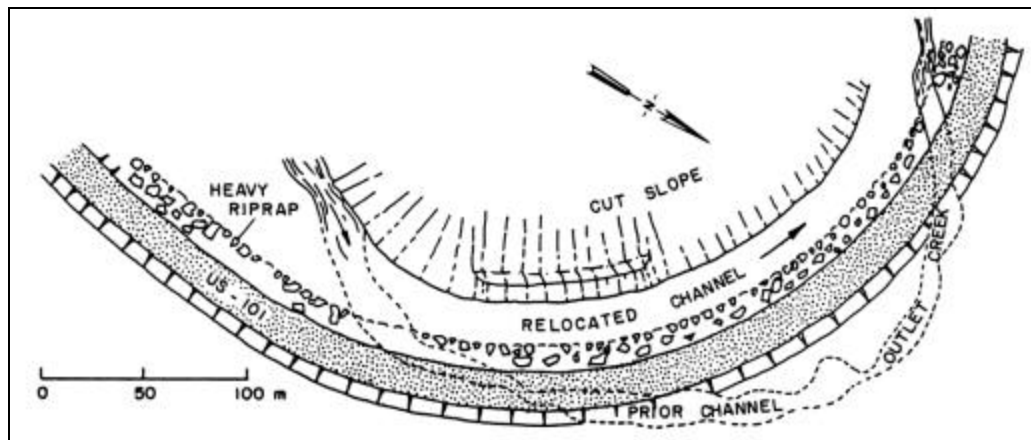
Plan sketch of channel relocation, Outlet Creek (Example 11).
